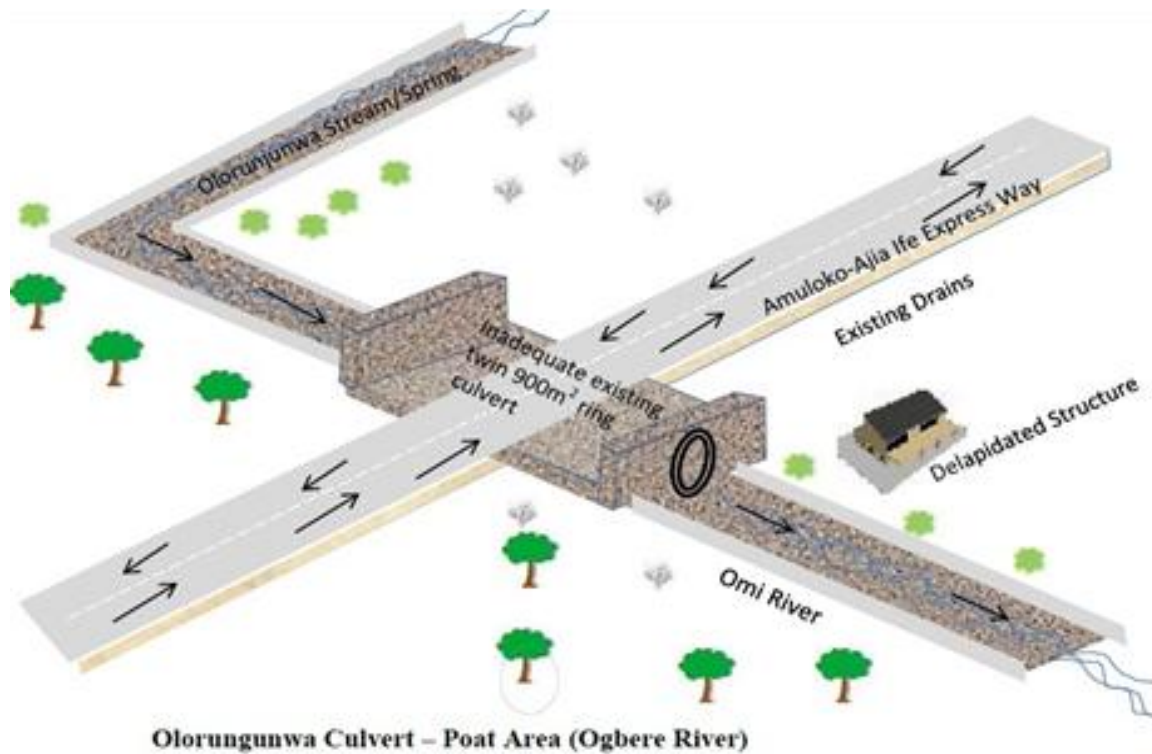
5: Olorungunwa Culvert – Poat Area (Omi River) Schematic Layout
